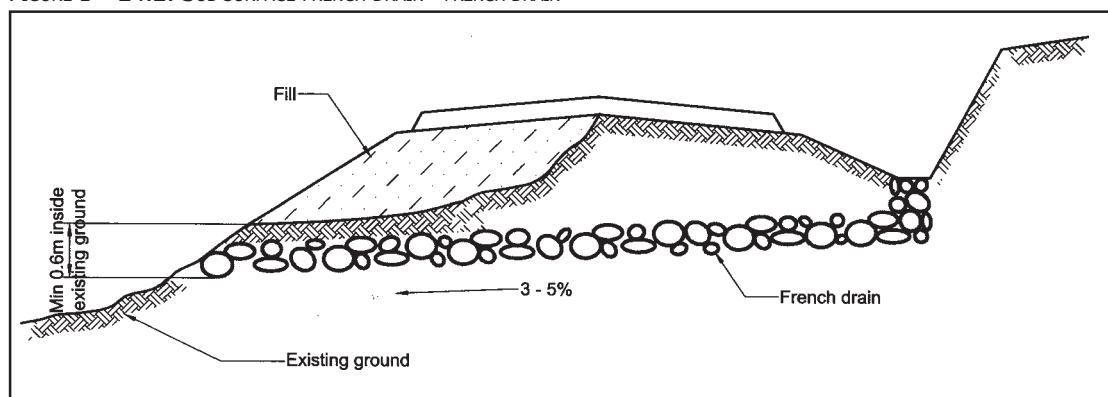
E4.2: SECTION THROUGH A FRENCH DRAIN
